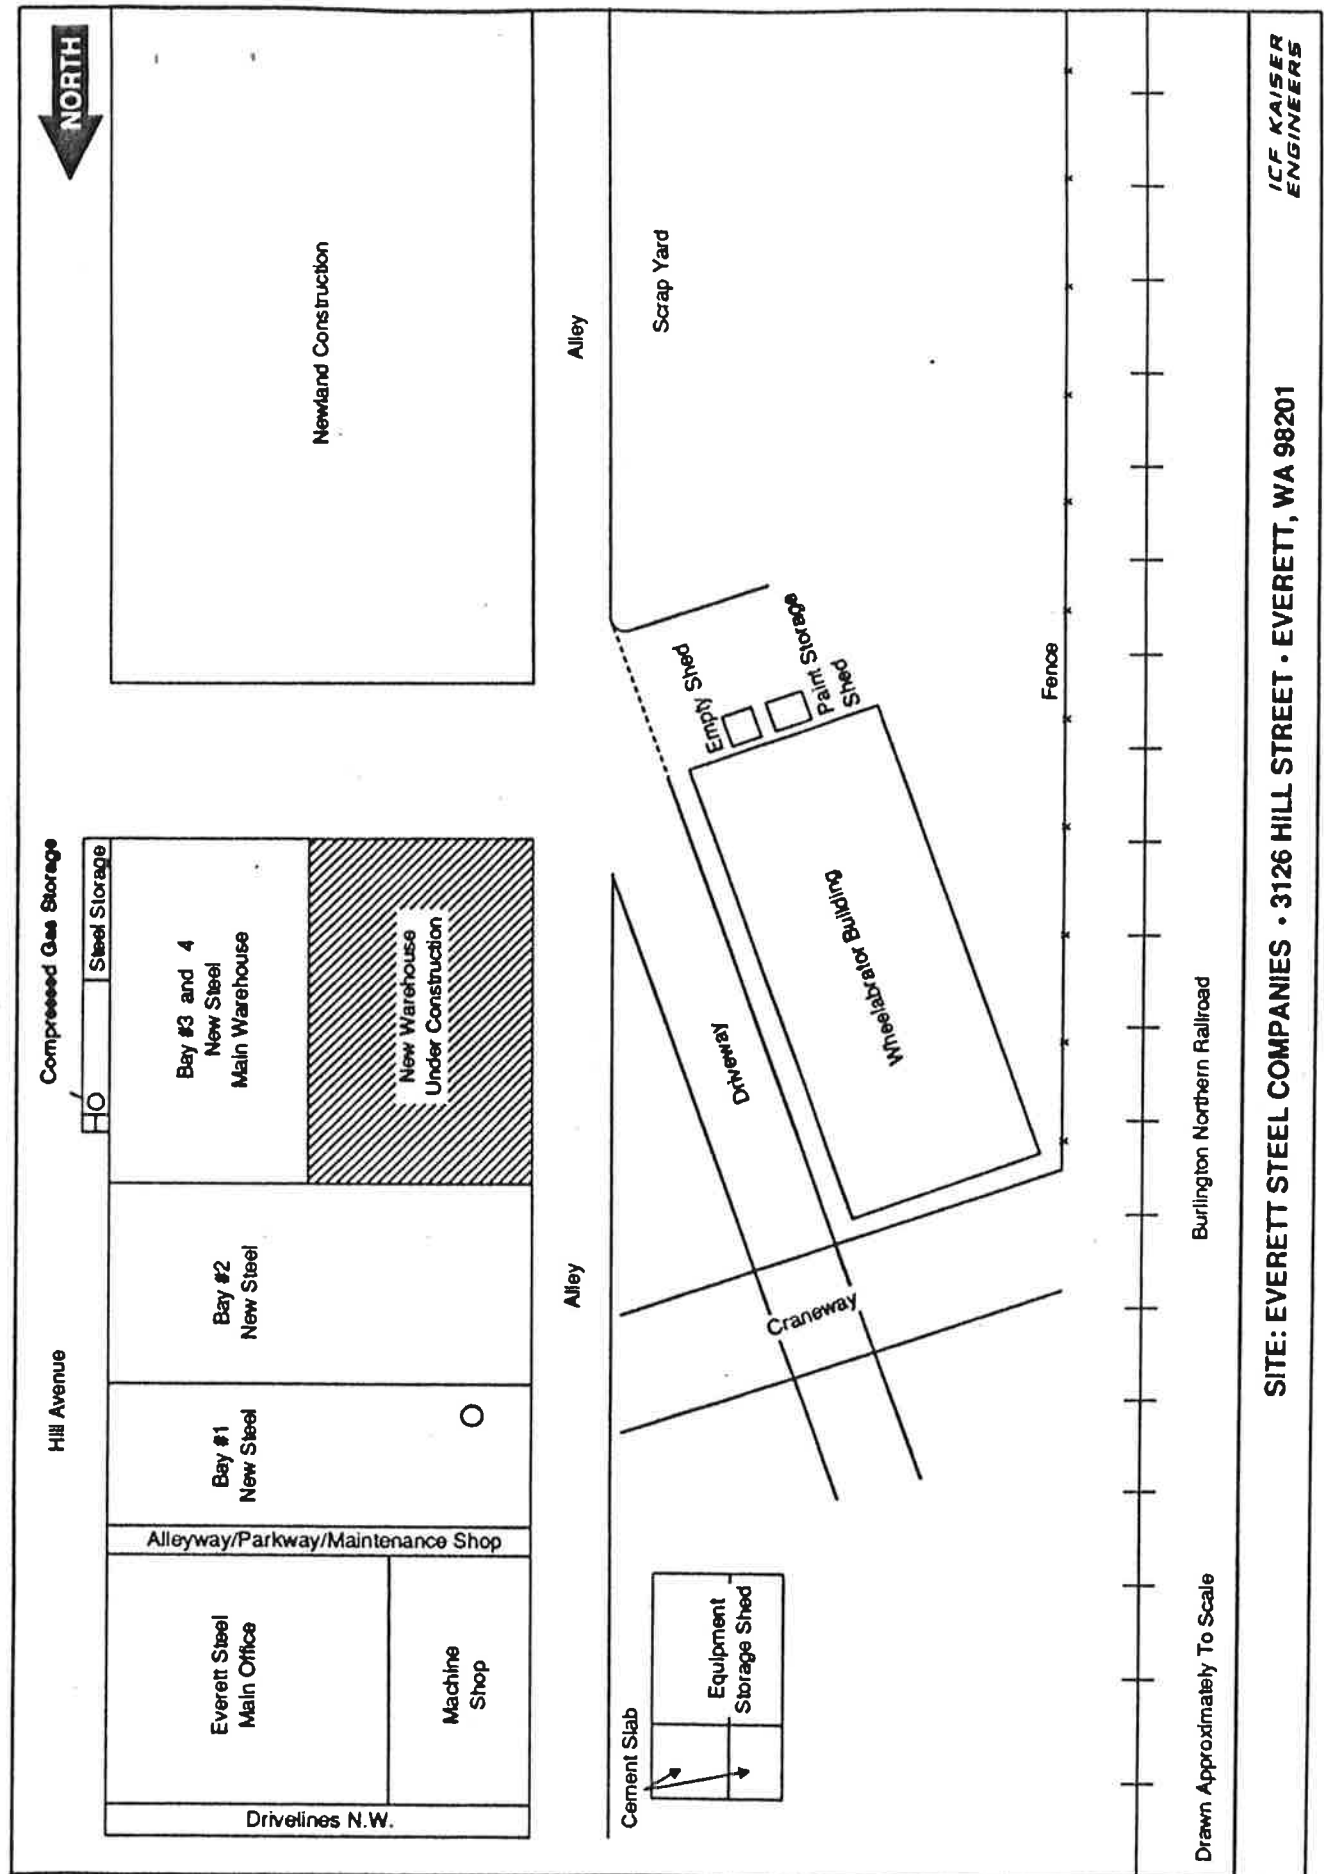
SITE PLAN OF WHEELABRATOR BUILDING
